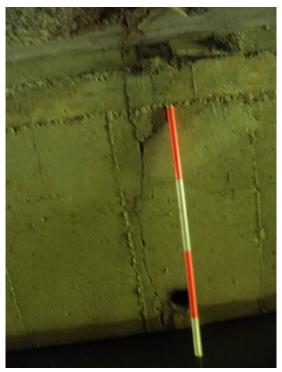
Drainage ditch CSP through south culvert wall near the east end of the culvert. Note the perforations in the bottom and distorted shape.
